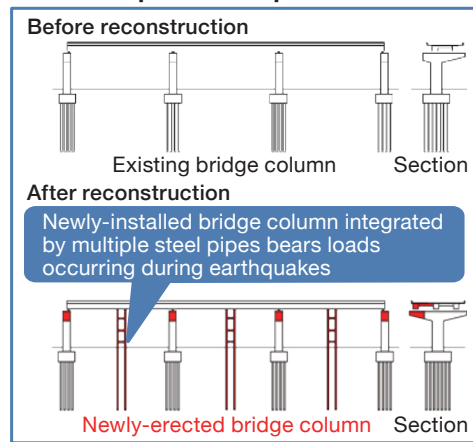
Image of Bridge Columns Integrated by Multiple Steel Pipes with Directly Connected Pipes
